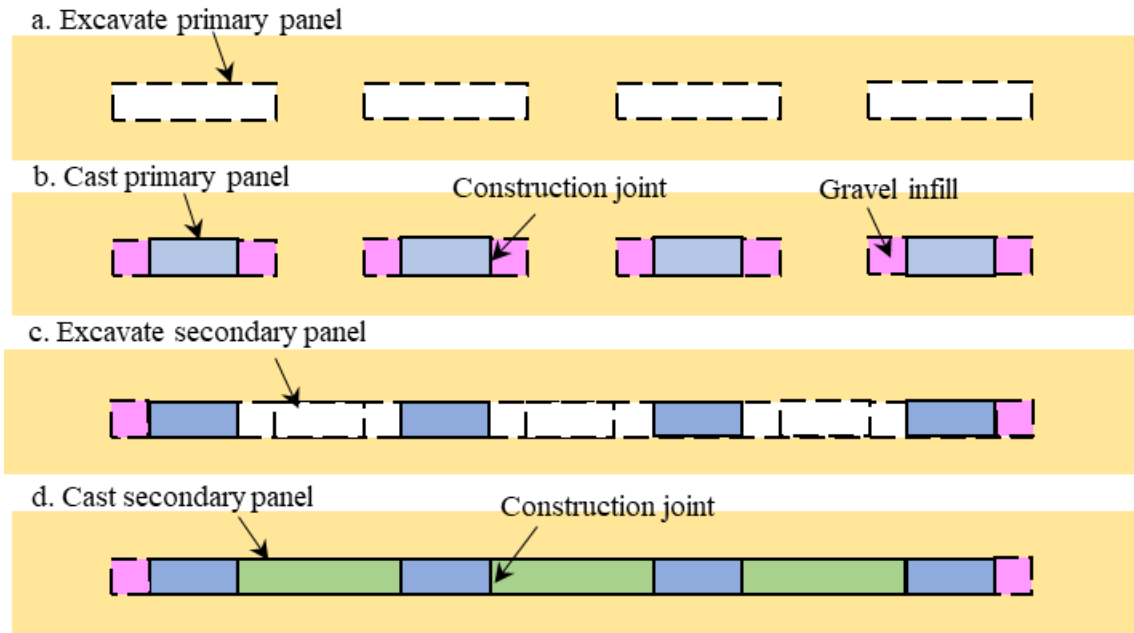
Plan view of the typical sequence for installation of diaphragm wall panels
